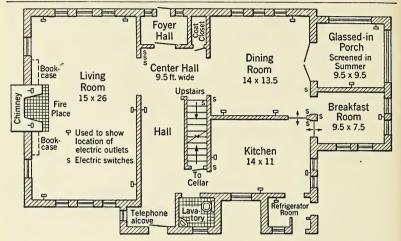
This diagram shows the floor plans of a fairly large colonial type of dwelling. Do you think that it is well-planned?
